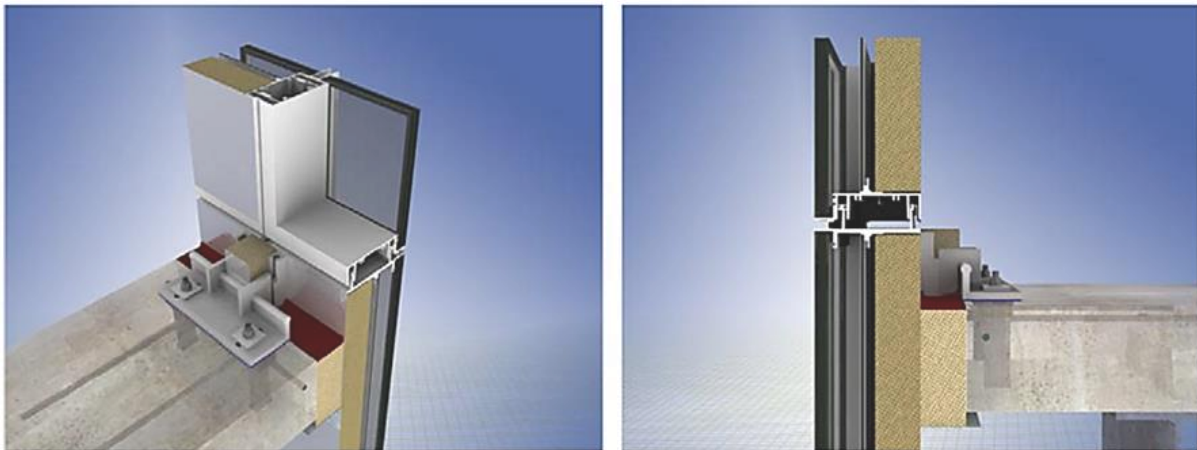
Typical stack joints and anchoring system for a unitised four-sided SSG configuration. The stack joints are placed at the top of each floor slab accommodating both vertical deflection and lateral movement. In the renderings above the curtain wall system is presented to be attached to the floor slab above the pair of the
